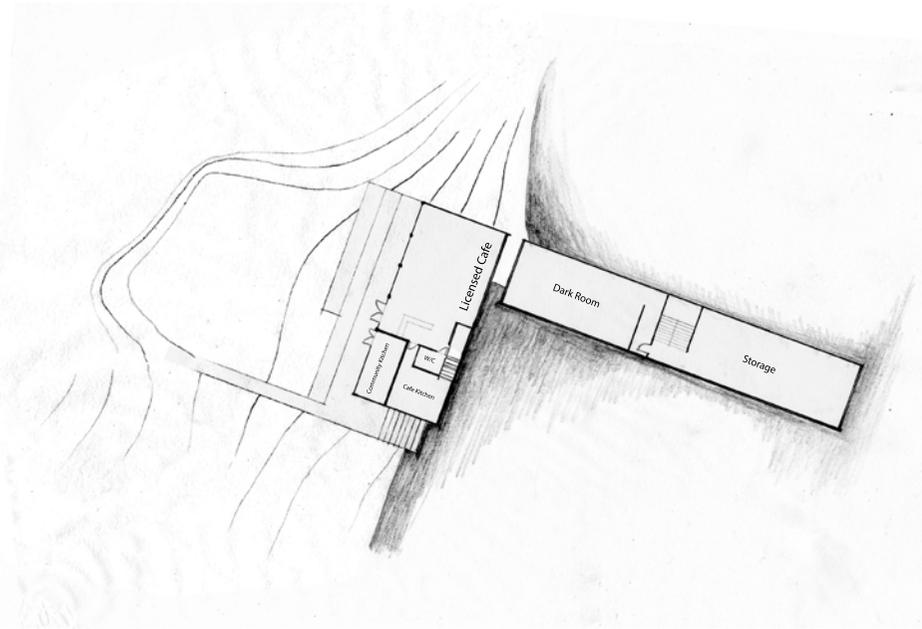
(Left) Lower Ground Floor Plan, housing a dark room, shared storage facilities, and a licensed cafe and public kitchen next door, looking out over the water.
